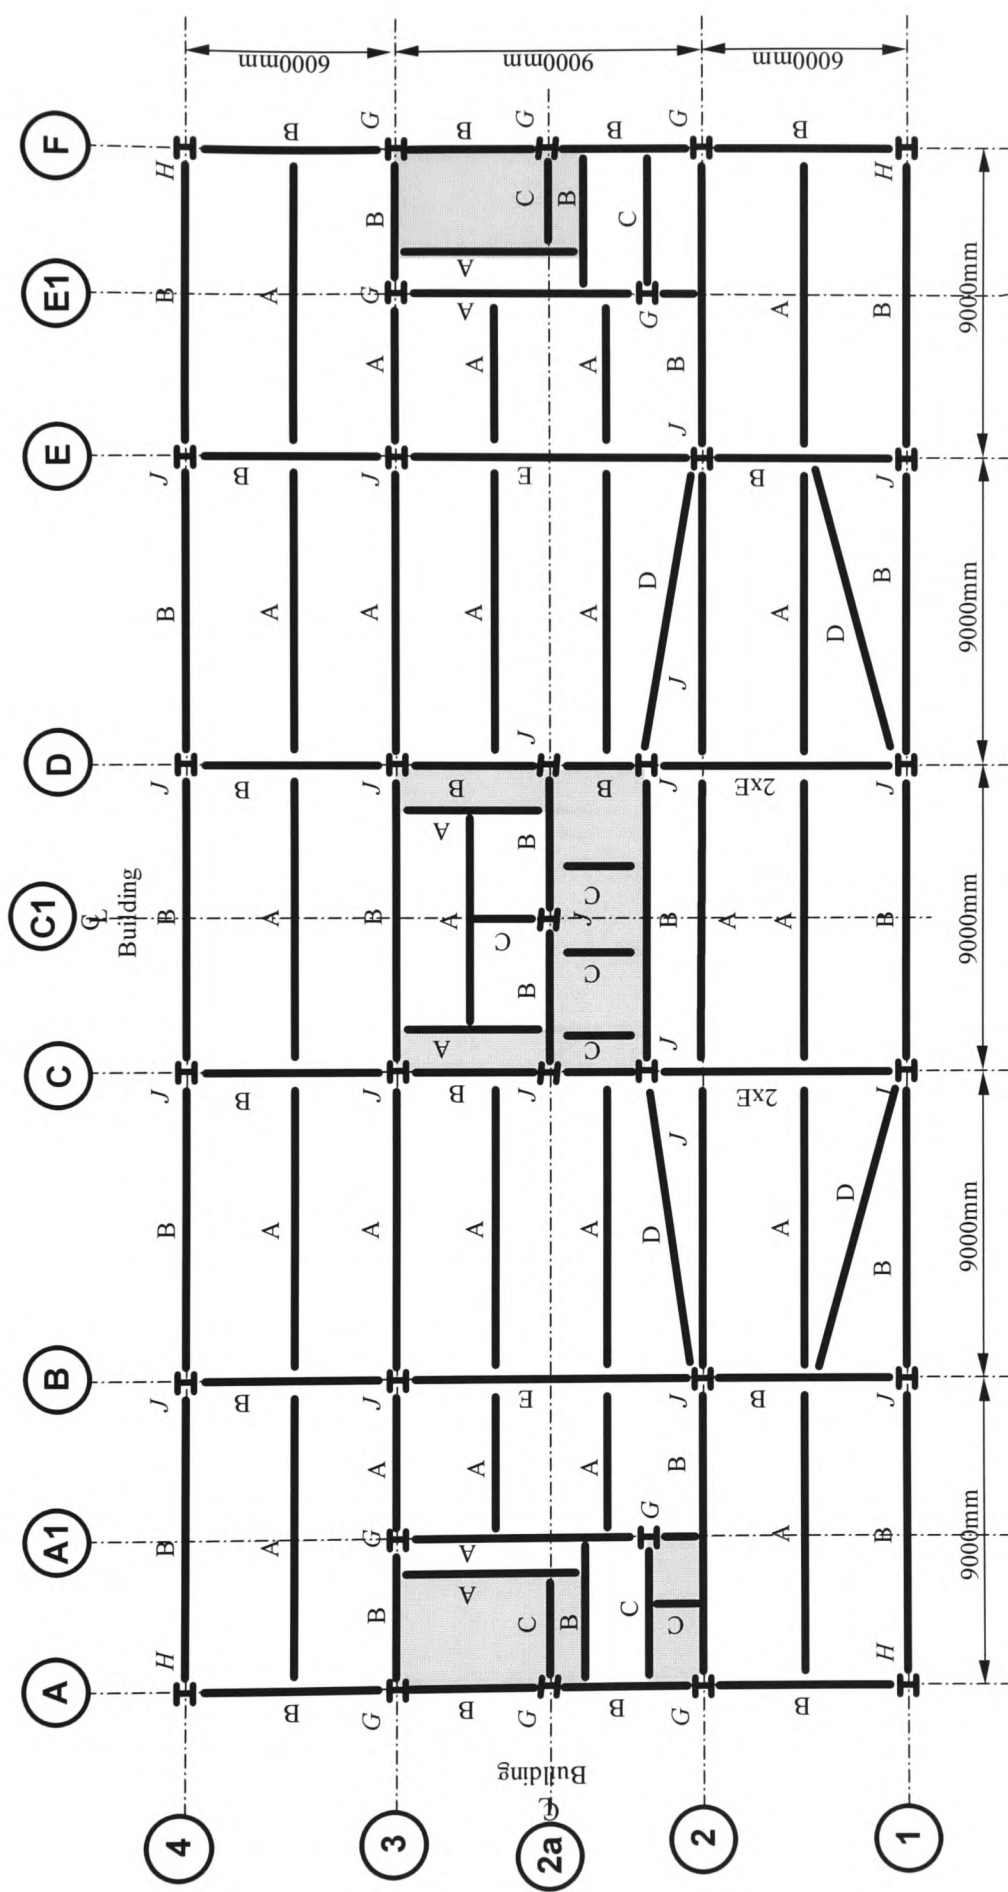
Plan on 2nd floor showing the general layout of the main structural elements
